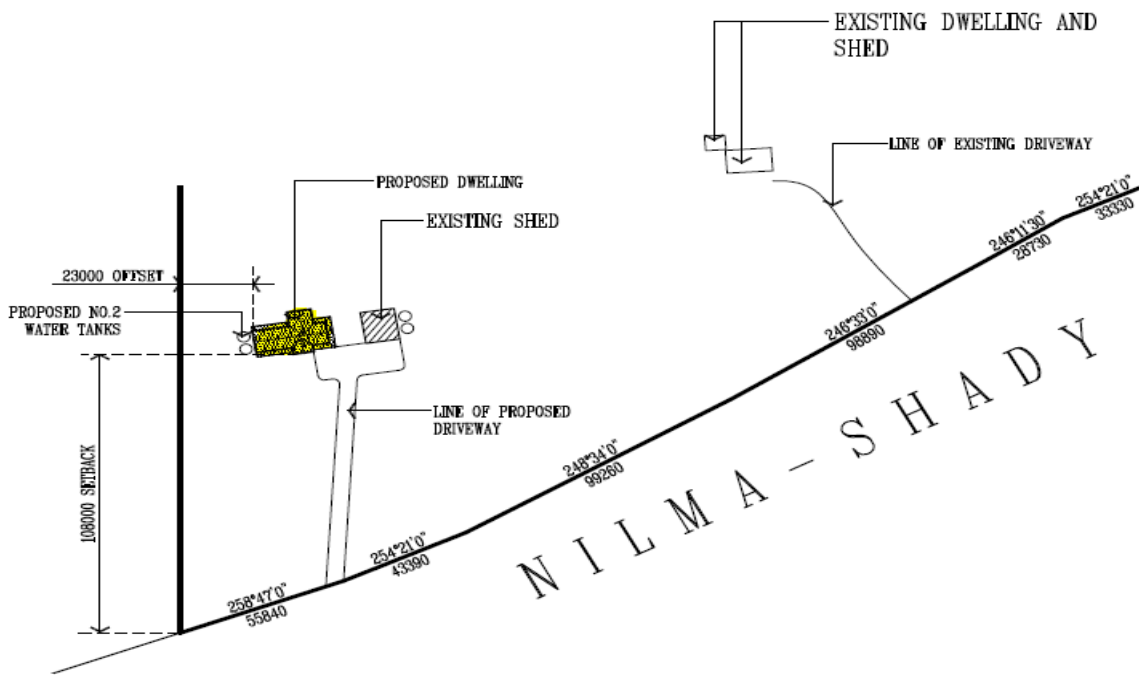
site plan showing the location of existing and proposed buildings.
